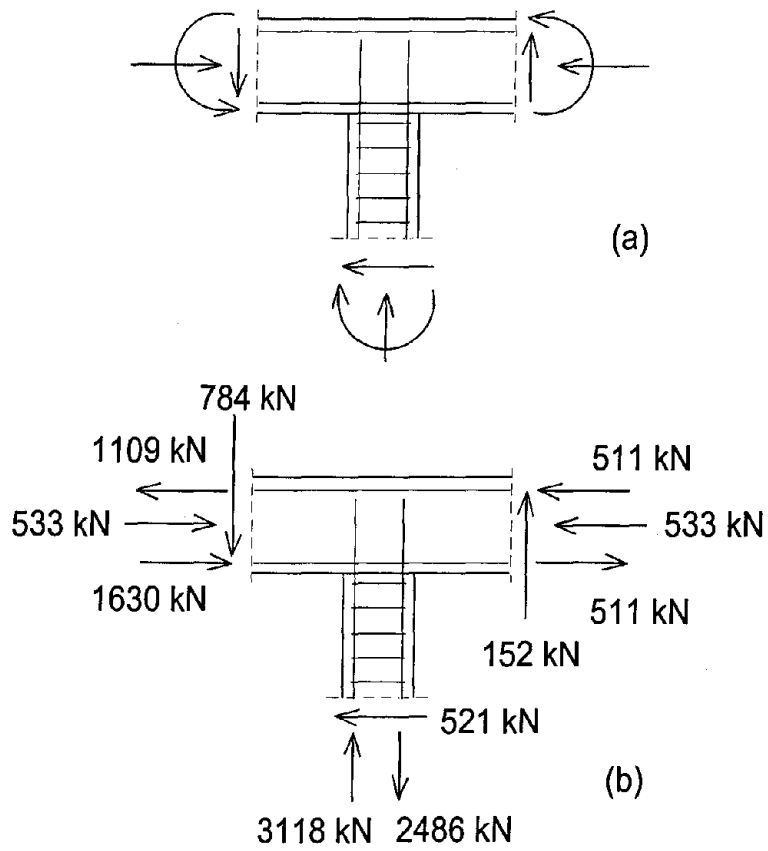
Joint forces at beam cap –column interior joint: (a) member forces, (b) corresponding force couples
